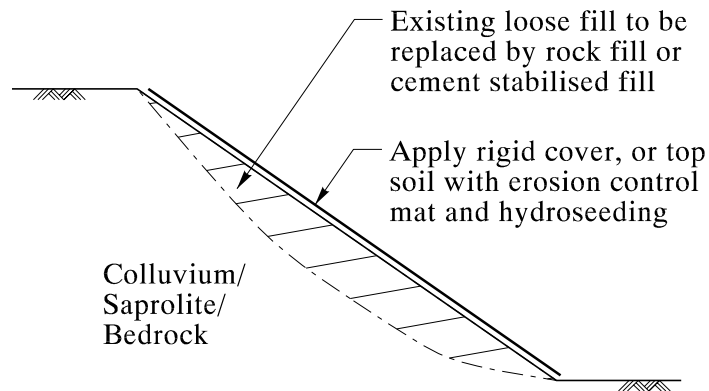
Methods 1 and 2, Rigid Surface Cover and Root Reinforcement
